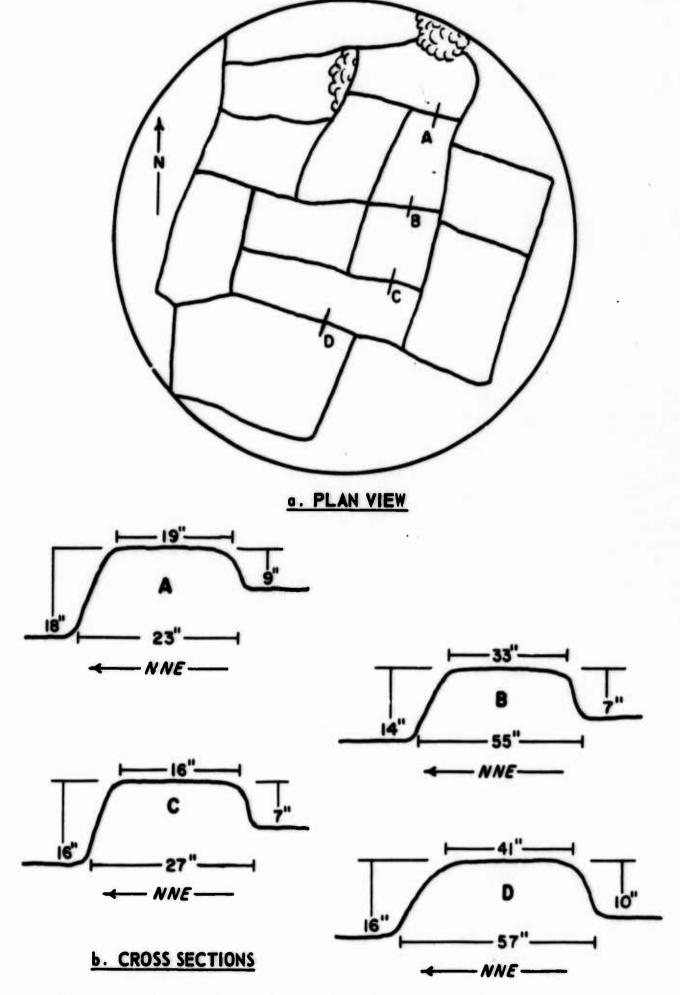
Terraced paddies--dike plan view and cross sections at site SG-105 (September 1964)
